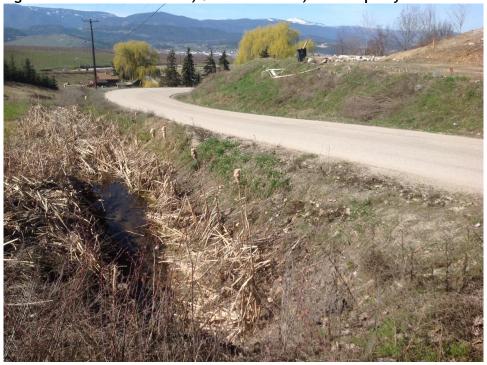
Looking northwest over staked property line and previous dwelling foundation
